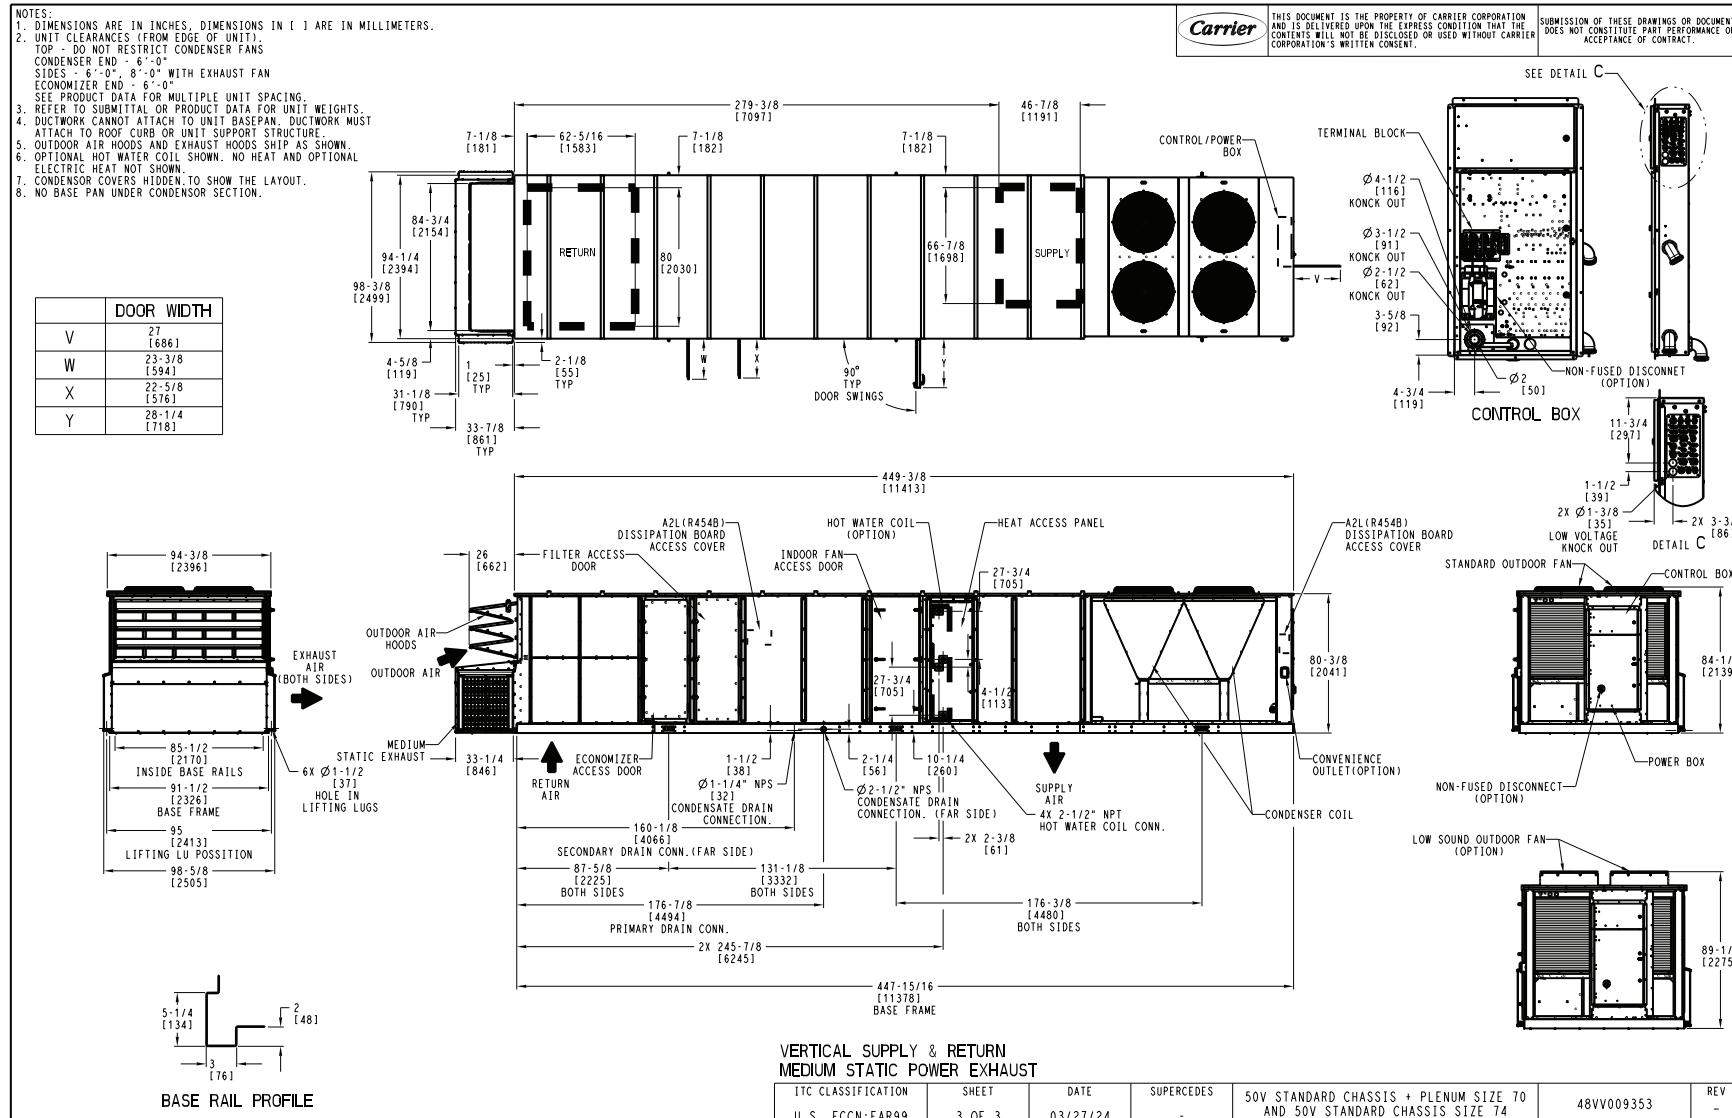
50V 70 Ton Standard Chassis with Plenum Section and 50V 75 Ton Standard Chassis (cont)
